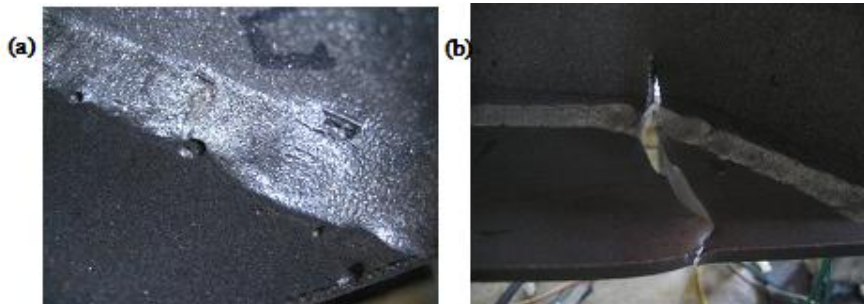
Photograph of fatigue crack initiation after 1500000 cycles and failure after 3200700 cycles
